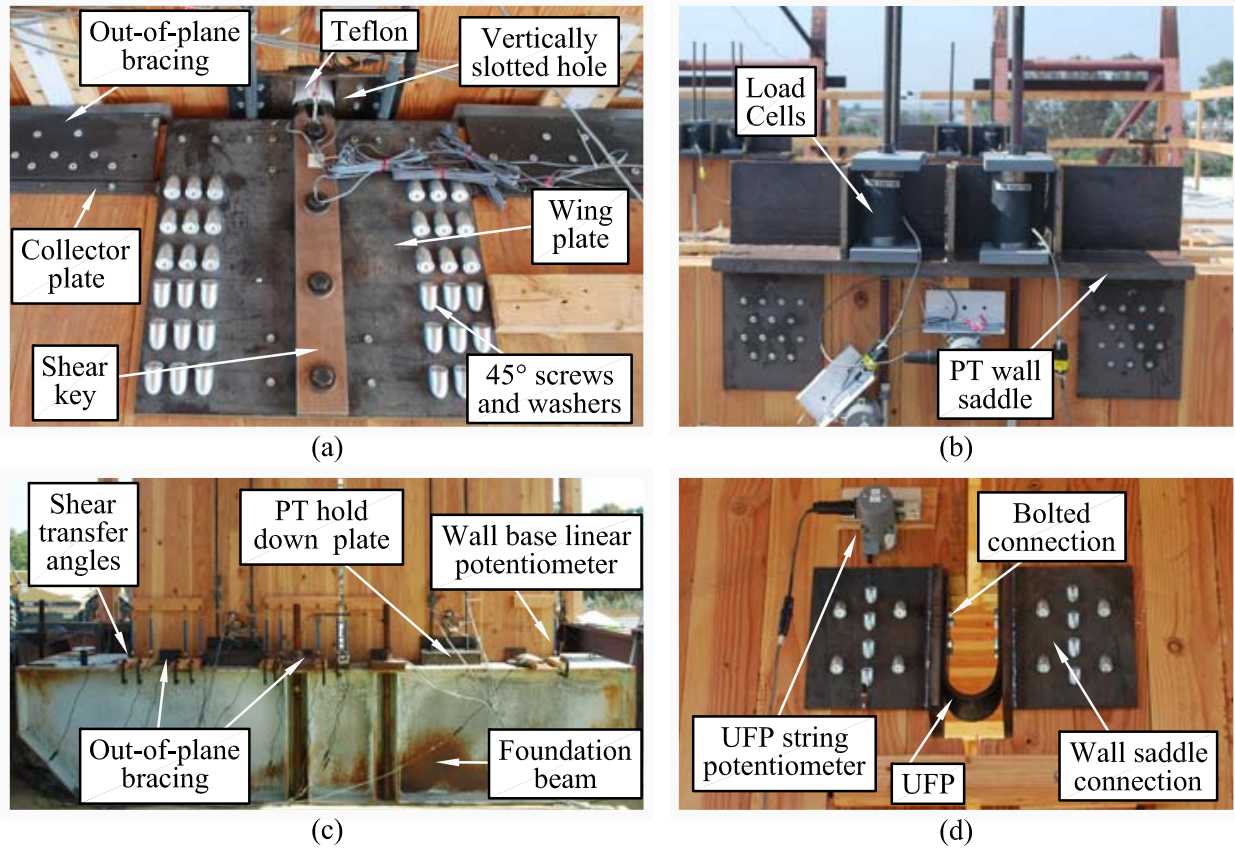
CLT rocking wall connection details: (a) wall-to-diaphragm shear transfer connection and out-of-plane bracing; (b) top of wall PT wall saddle connection; (c) base of wall shear transfer, bracing, and PT hold down connection; and (d) UFP energy dissipator connection
